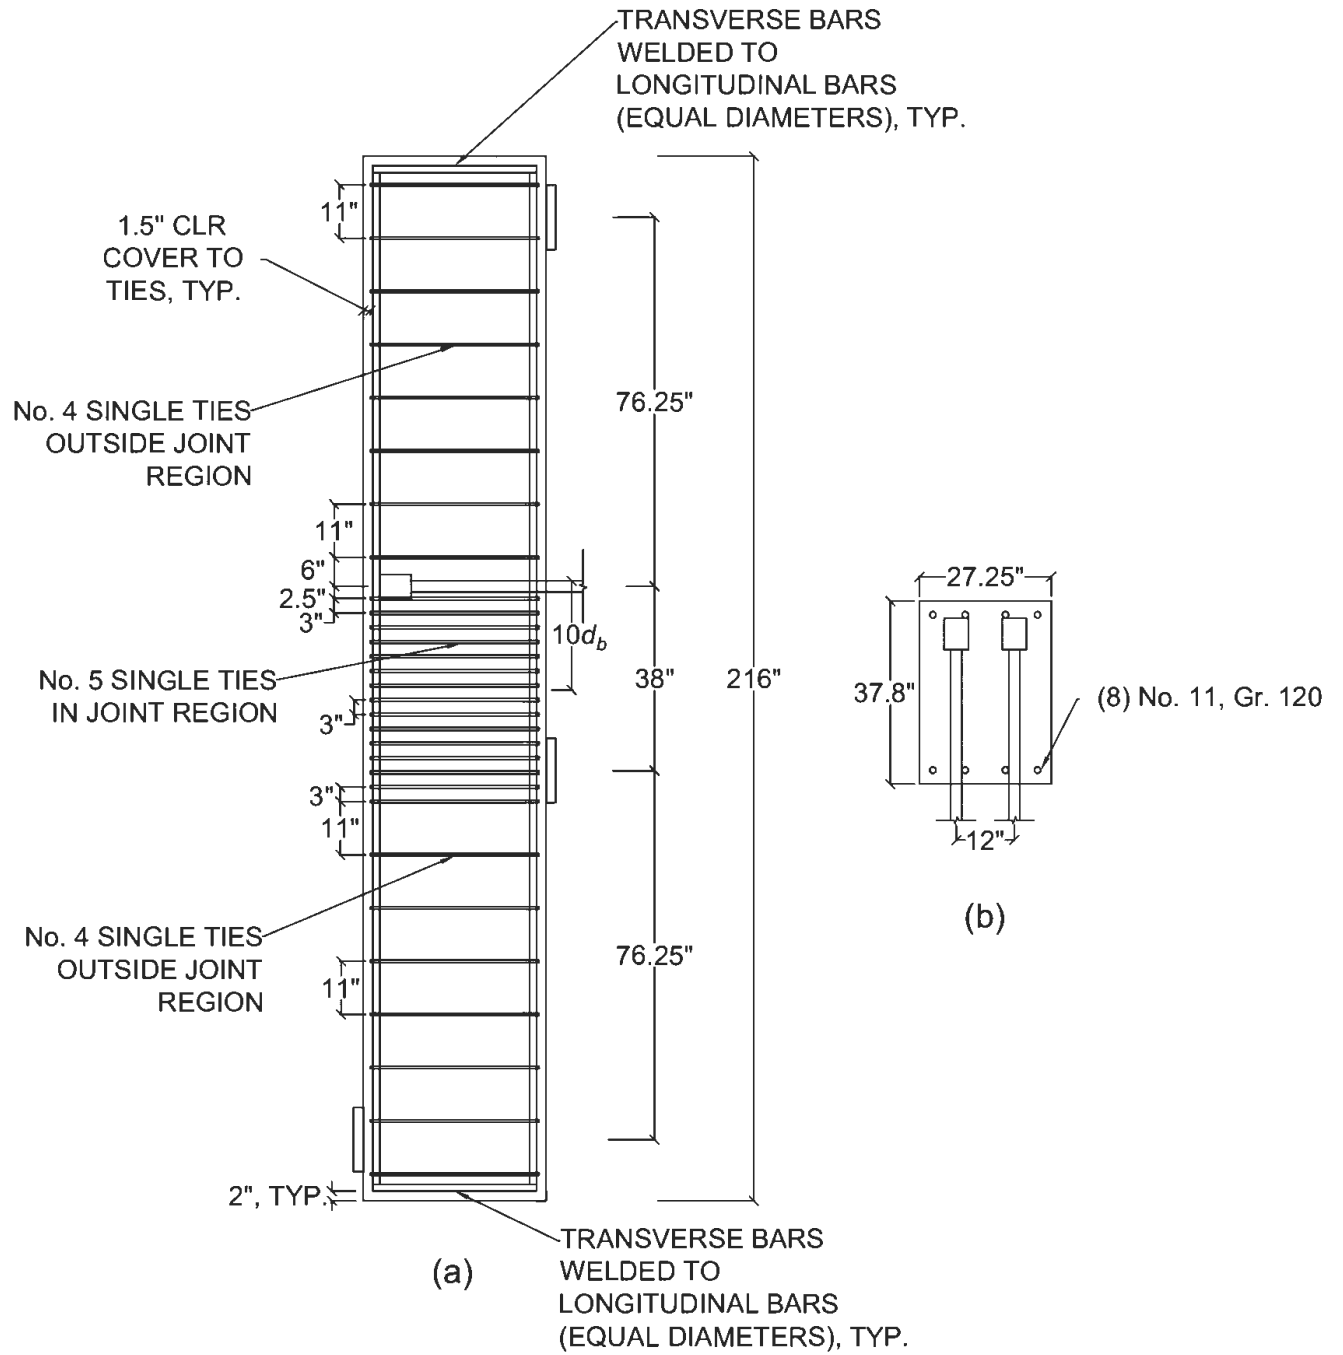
Details of reinforcement layout for No. 18 headed bar specimen 18-6: (a) elevation, (b) cross-section
